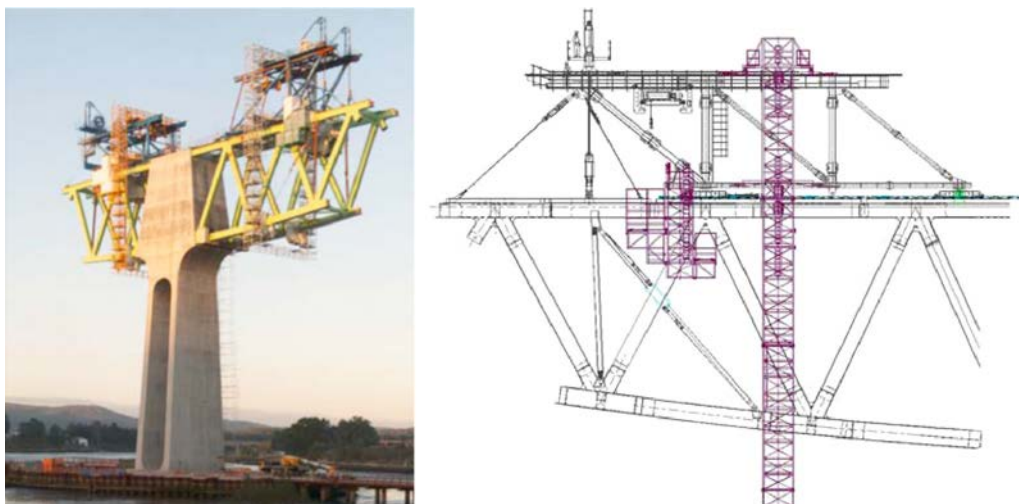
Photograph and drawing of access platforms and protected areas for welding.
